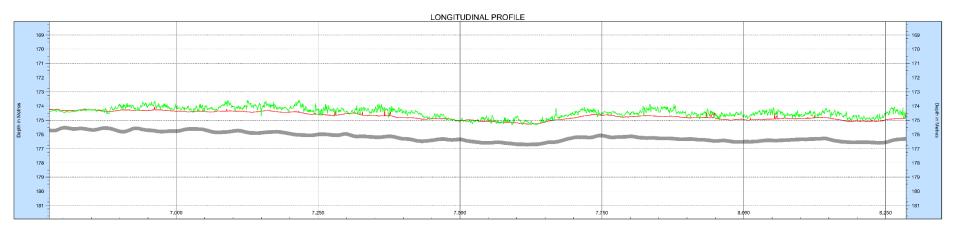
PL4556 As-built alignment sheet KP6.776 to KP8.286
